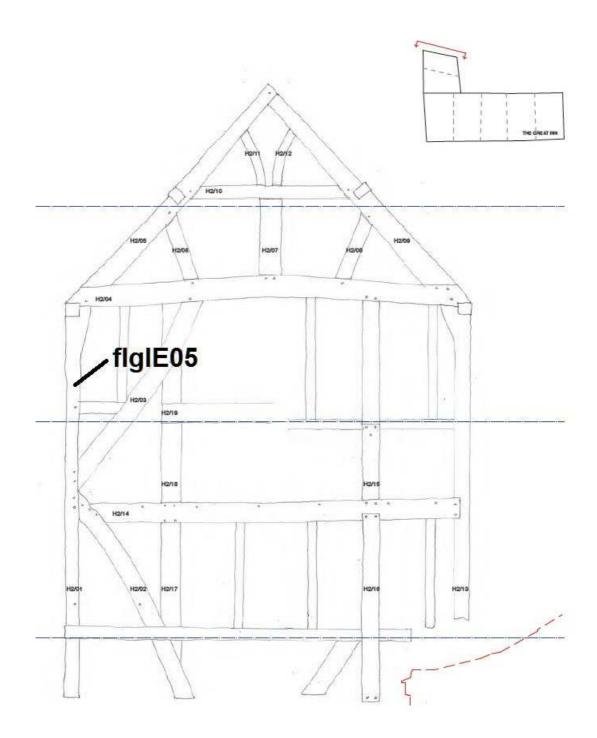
Drawing of the west wall of the southern extension showing the timber sampled (after Butler Hegarty Architects)
